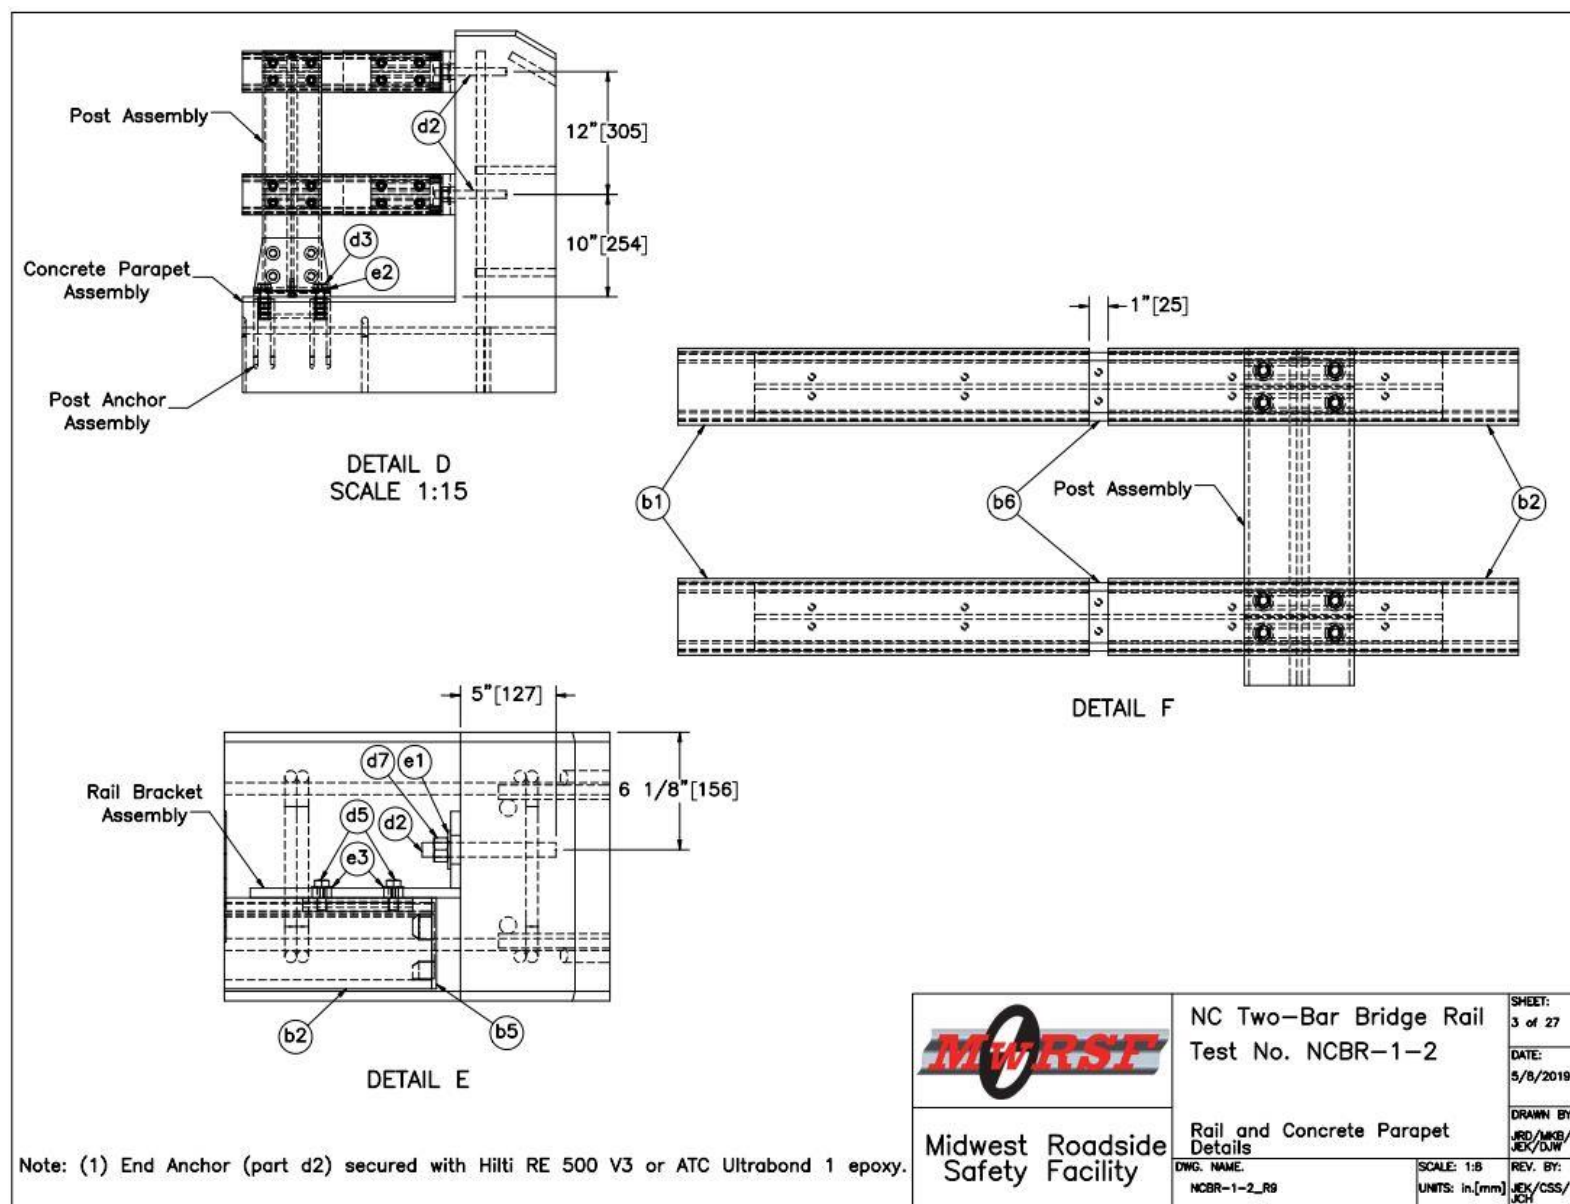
Rail and Concrete Parapet Details, Test Nos. NCBR-1 and NCBR-2
